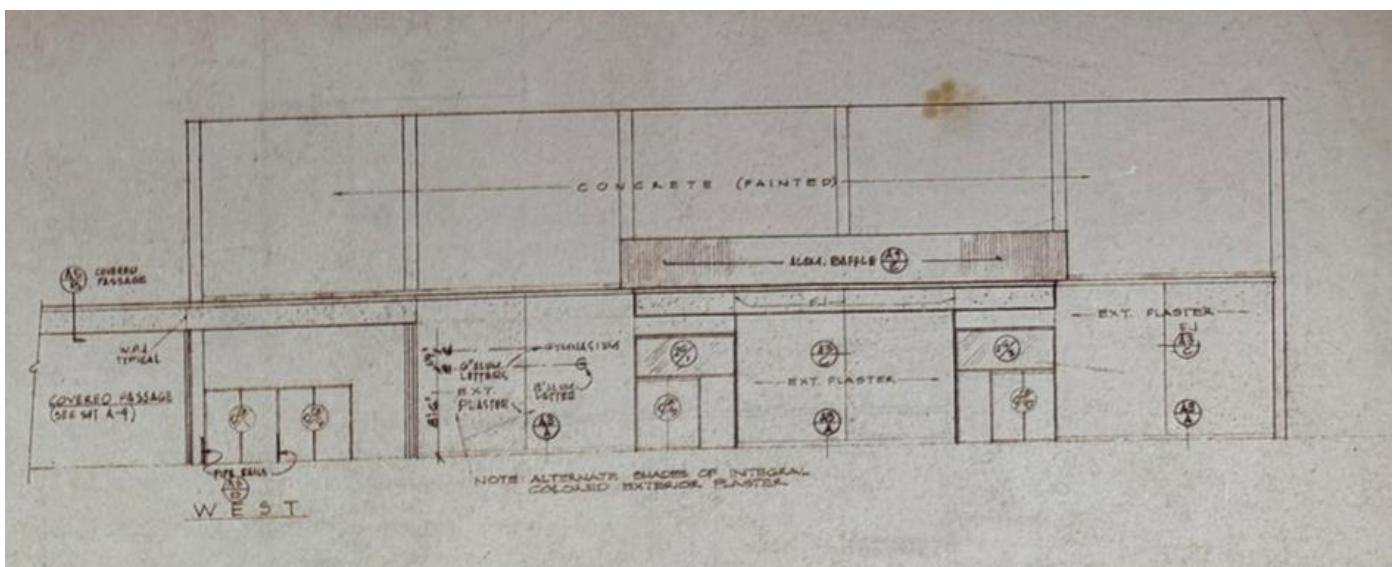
1967 drawing of Gymnasium (G2), west elevation (LATTC Facilities 2025)
